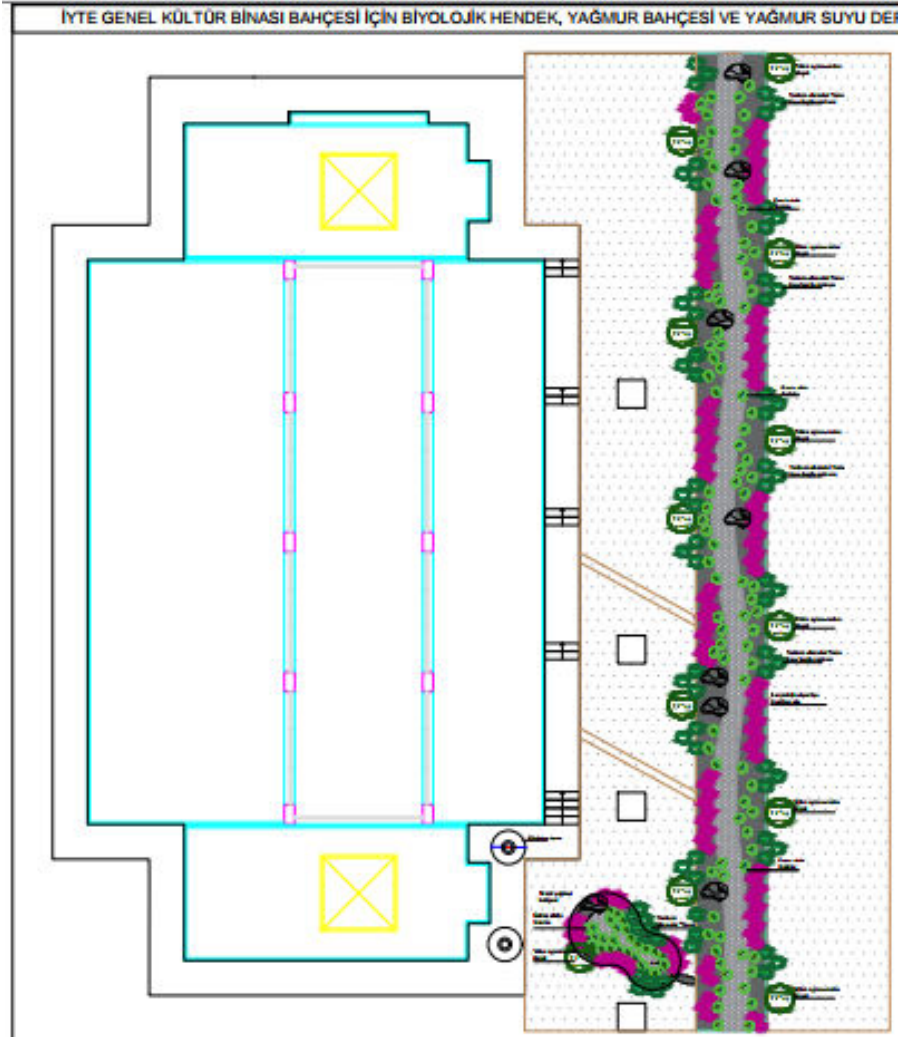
Site Plan of the Rainwater Harvesting Best Management Practices in IZTECH Campus by IMWRRIC
